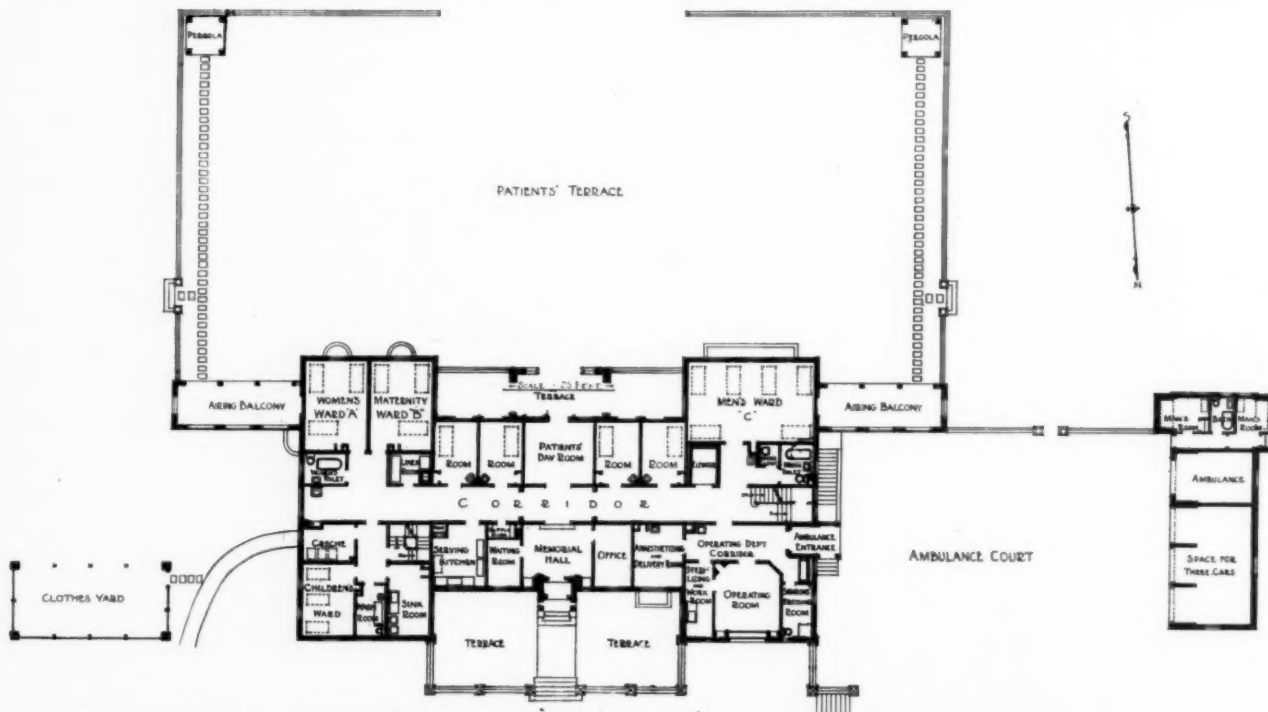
First floor plan, with patients' terrace and ambulance court.
